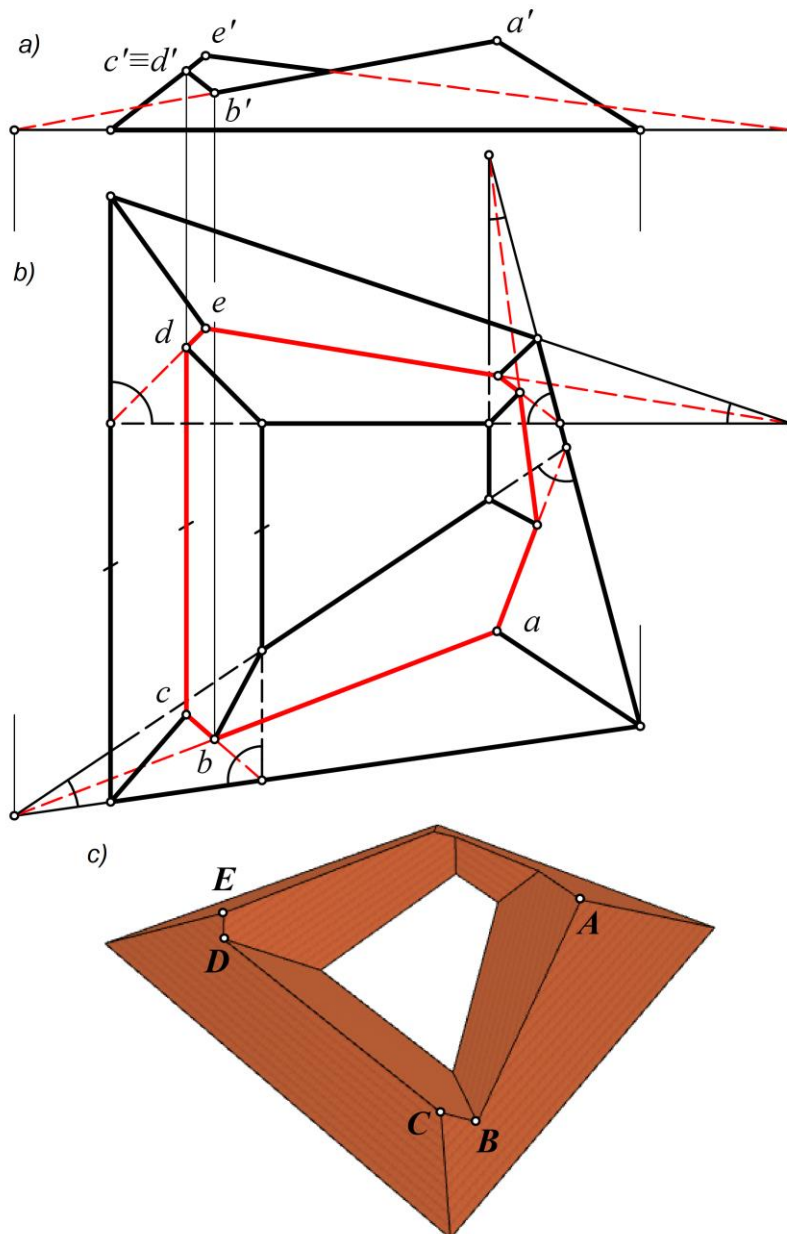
Construction of intersecting lines of roof slopes (*a* – frontal; *b* – horizontal projection) and the view of the roof of the building with the inner courtyard in perspective (*c*)
